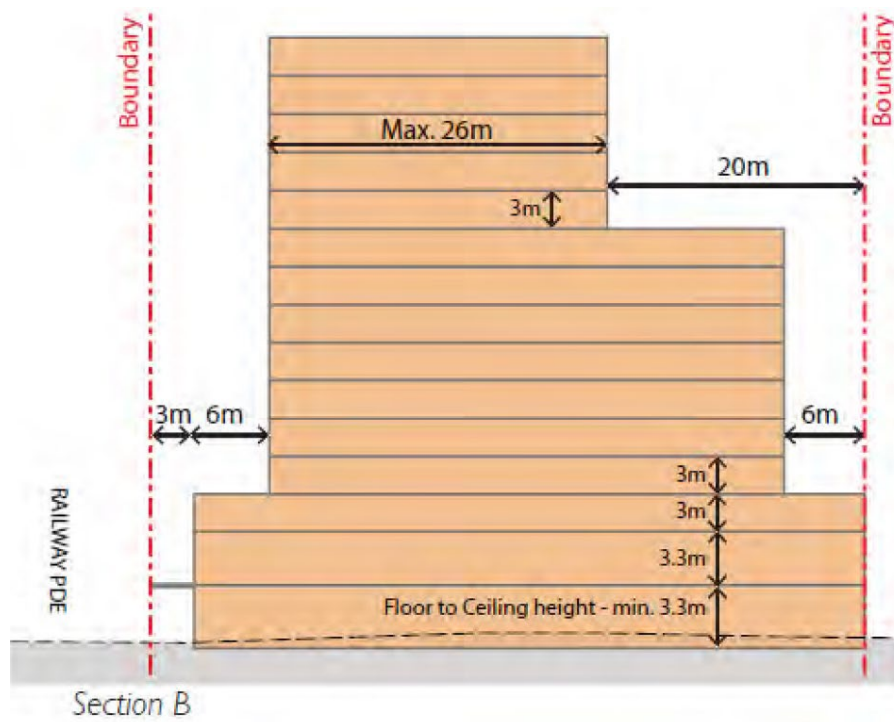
North-South Section of Site Building Envelope
